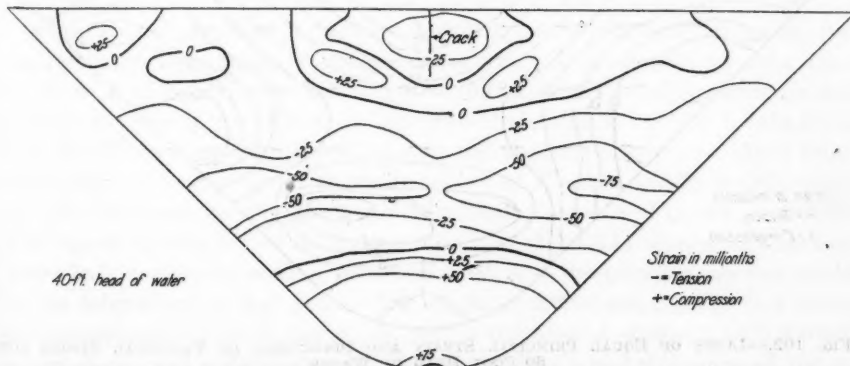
LINES OF EQUAL VERTICAL STRAINS ON DOWN-STREAM FACE FOR 40-FOOT HEAD OF WATER AFTER VERTICAL CENTER CRACK AT TOP HAD OCCURRED.
